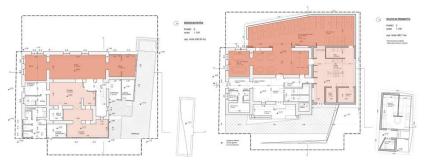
Ground floor with dining rooms: status quo (left) and project (right)
